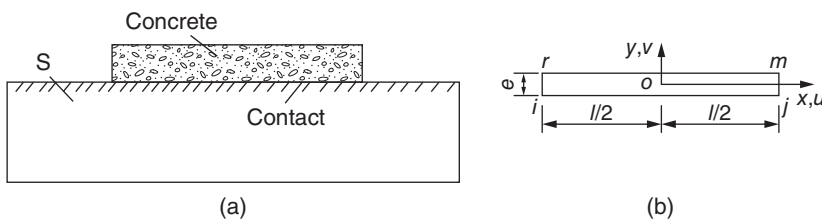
Foundation beam and contact element. (a) Foundation and beam; (b) contact element.
